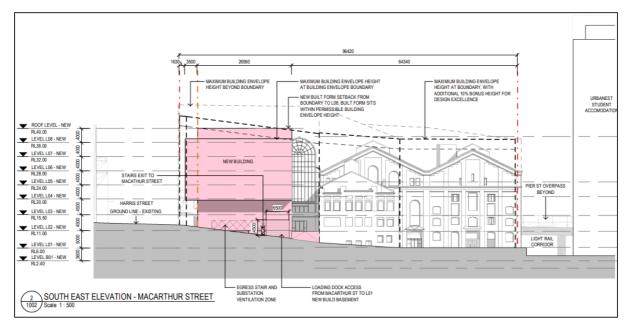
| South East Elevation of the Reference Design showing the indicative new building within the existing Harris Street forecourt (Source: Applicant's Architectural Plans)
